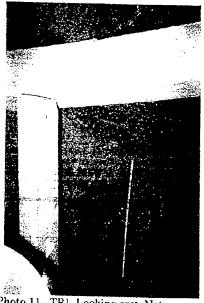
TP1. Looking east. Note temporary timber shoring to support loose boulder foundation. The tape measure is resting on the garage underpinning setback approximately 24 inches from face of foundation wall.
